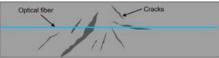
Cracks arising in concrete due to the earthquake Hou et al., (2021)
